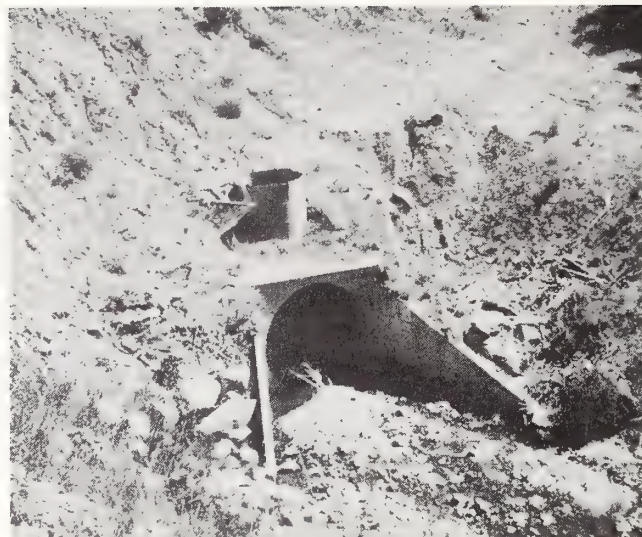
Metal pipe debris riser placed during initial construction of culvert provides relief in case the latter becomes plugged. (See Photo 34.)
